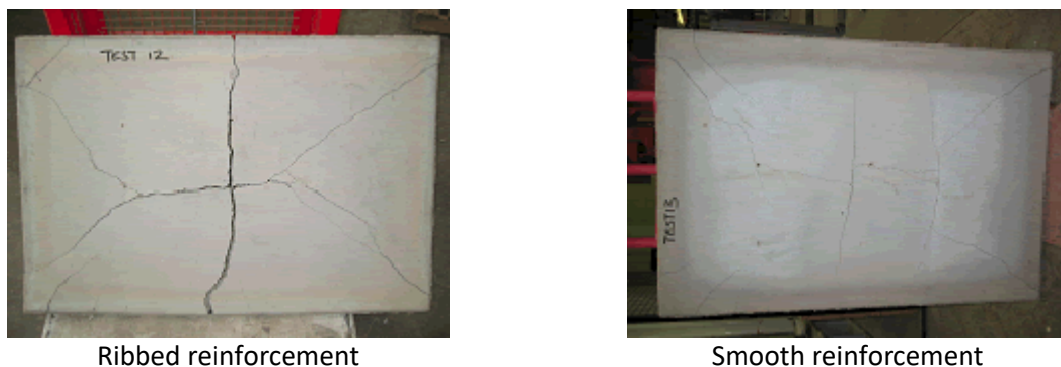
| Concrete slabs with different types of reinforcement, exposed to high temperatures [76]
